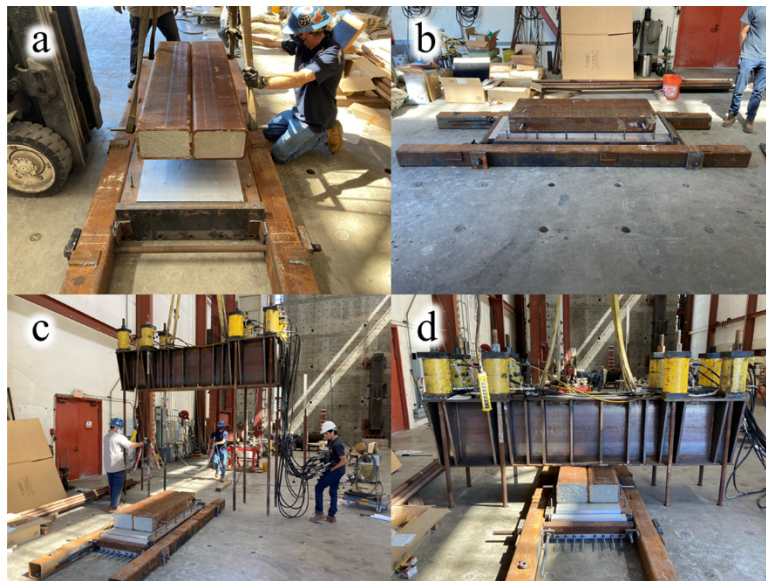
(a) Placing concrete-filled HSS beams on top of the compaction plates. (b) The HSS beams cover all the three sections. (c) Lifting and placing the FTSL fixture on top of the HSS beams. (d) Fixing screws to the concrete floor and compacting the three sections simultaneously
